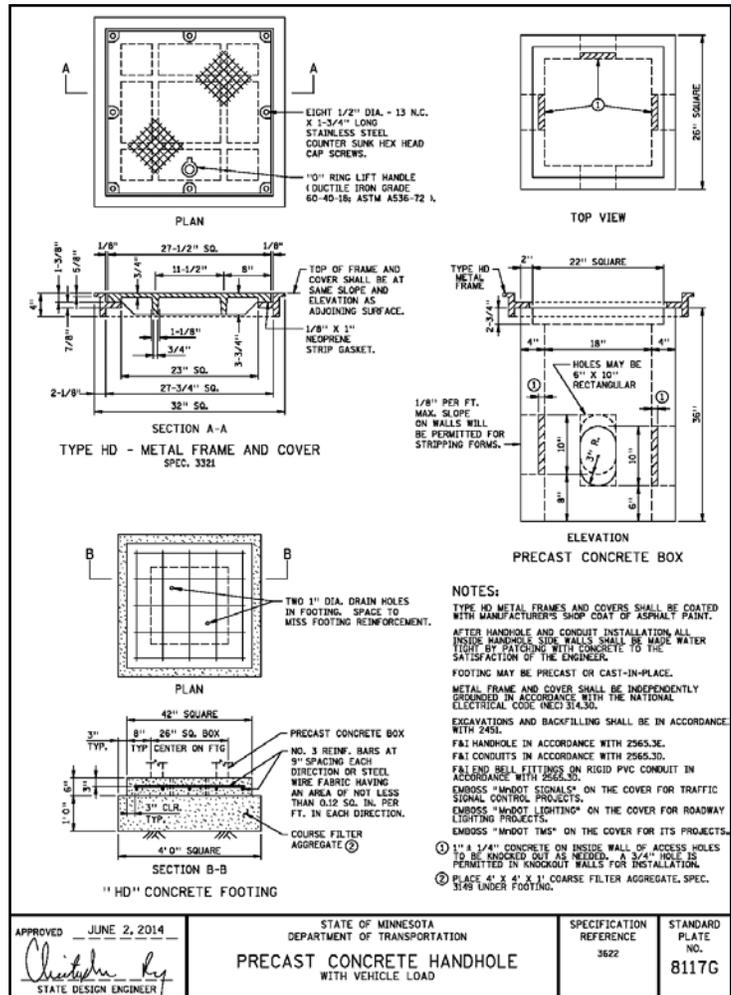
Precast Concrete Handhole Deliberate Vehicular Traffic
